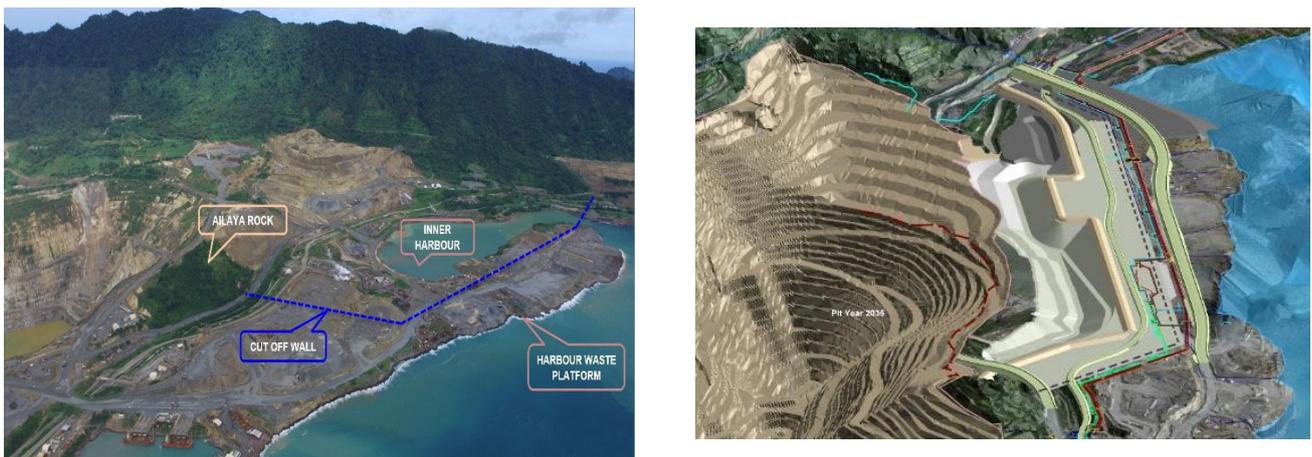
& 7 – Cut of wall Alignment and Seepage Barrier / Kapit Pit at EOM
